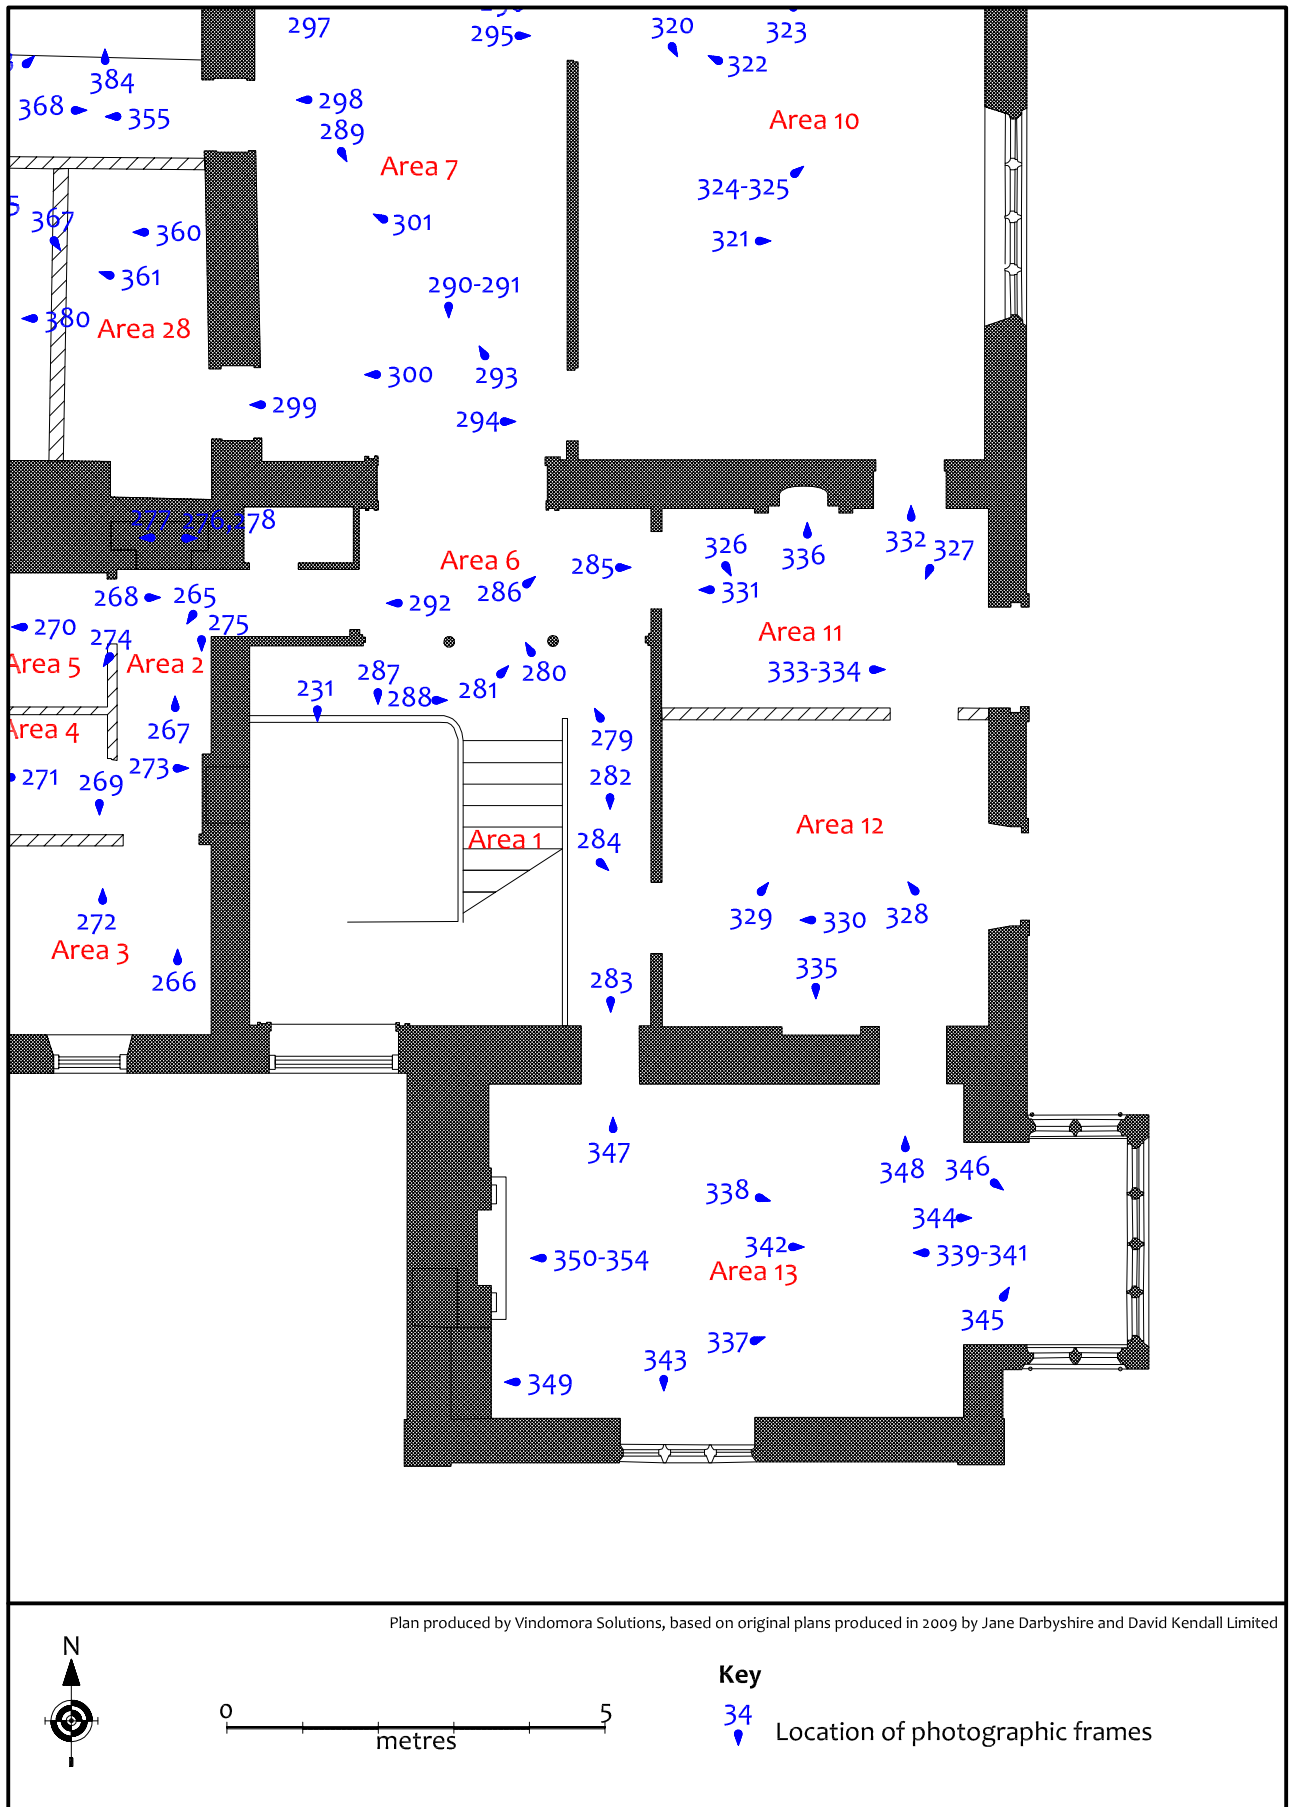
First floor plan showing location of photographic frames. Areas 1-2, 6, 11-13, 28,
